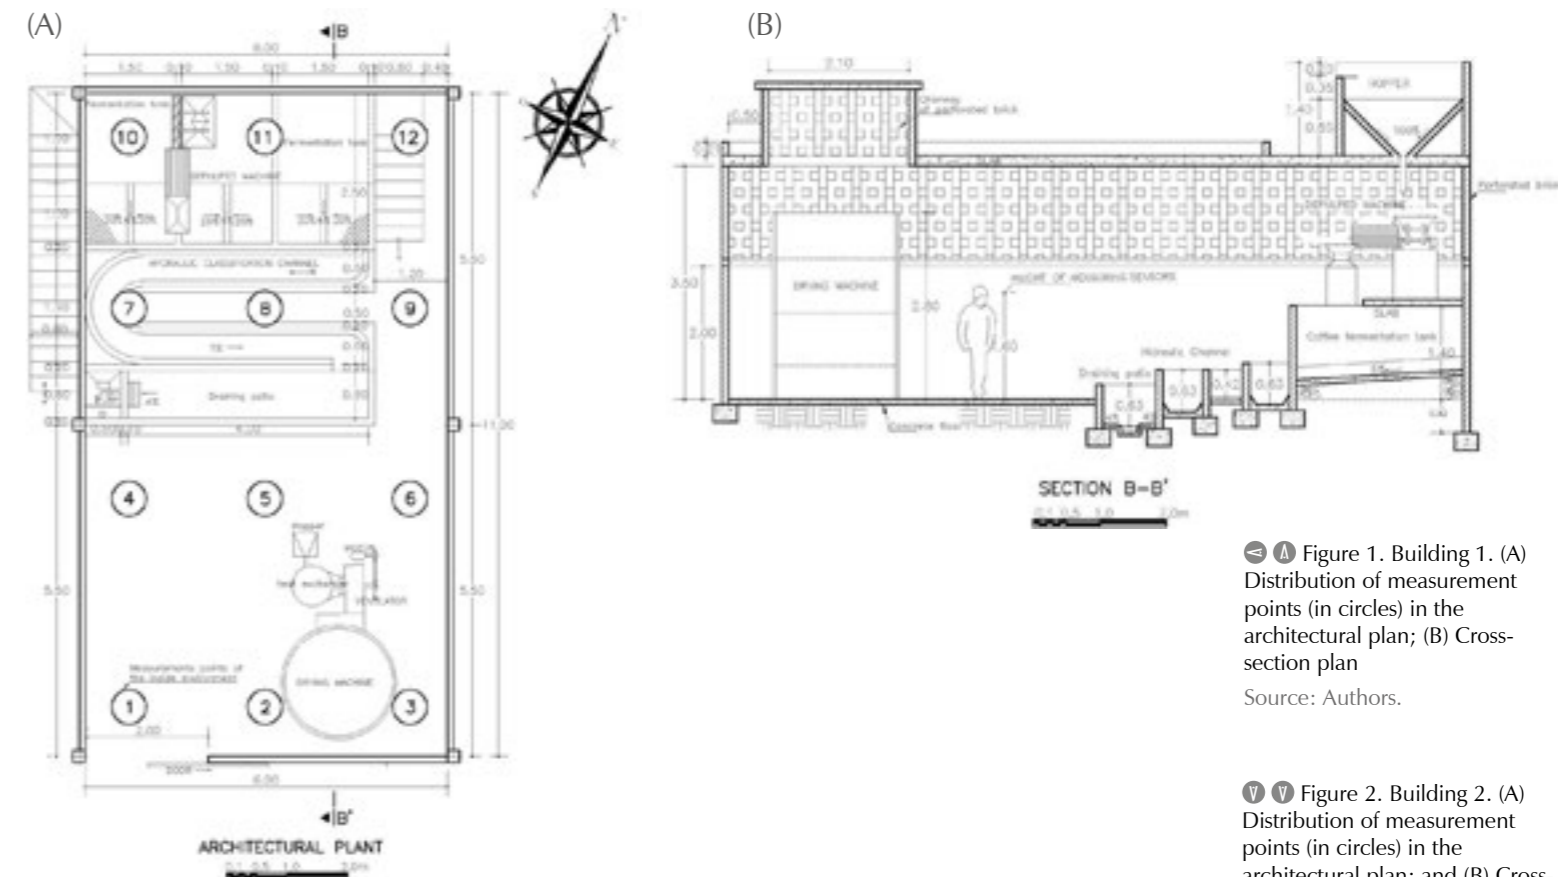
Building 1. (A) Distribution of measurement points (in circles) in the architectural plan; (B) Cross-section plan
